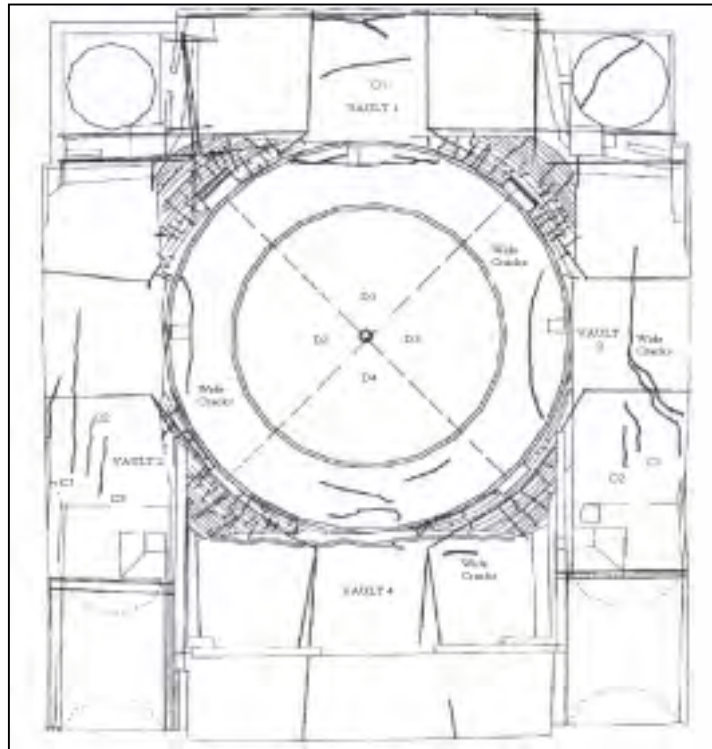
Muayede Hall's Dome and Vaults' element codes and the crack areas
